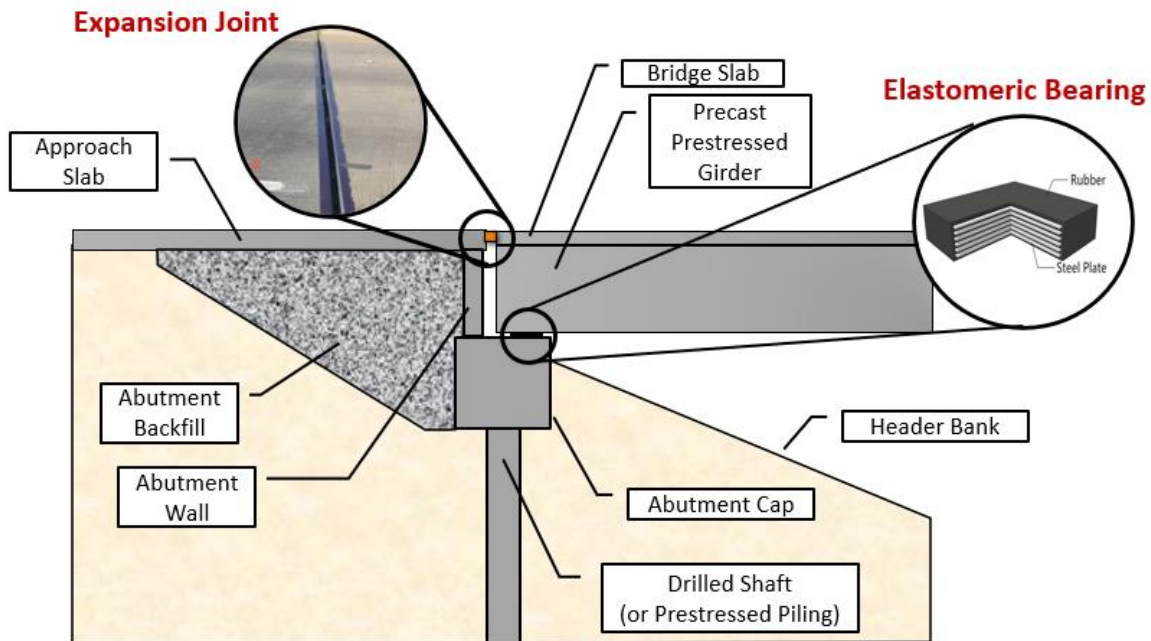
1: A sketch of a conventional bridge details with deck expansion joints
